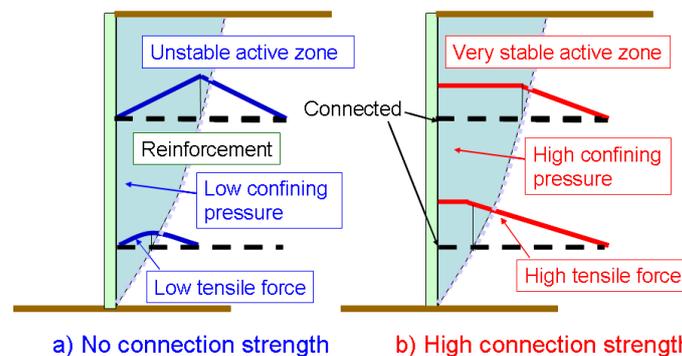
Different wall behaviours: a) no connection force between the reinforcement and the facing; and b) high connection force (Tatsuoka, 1992).
